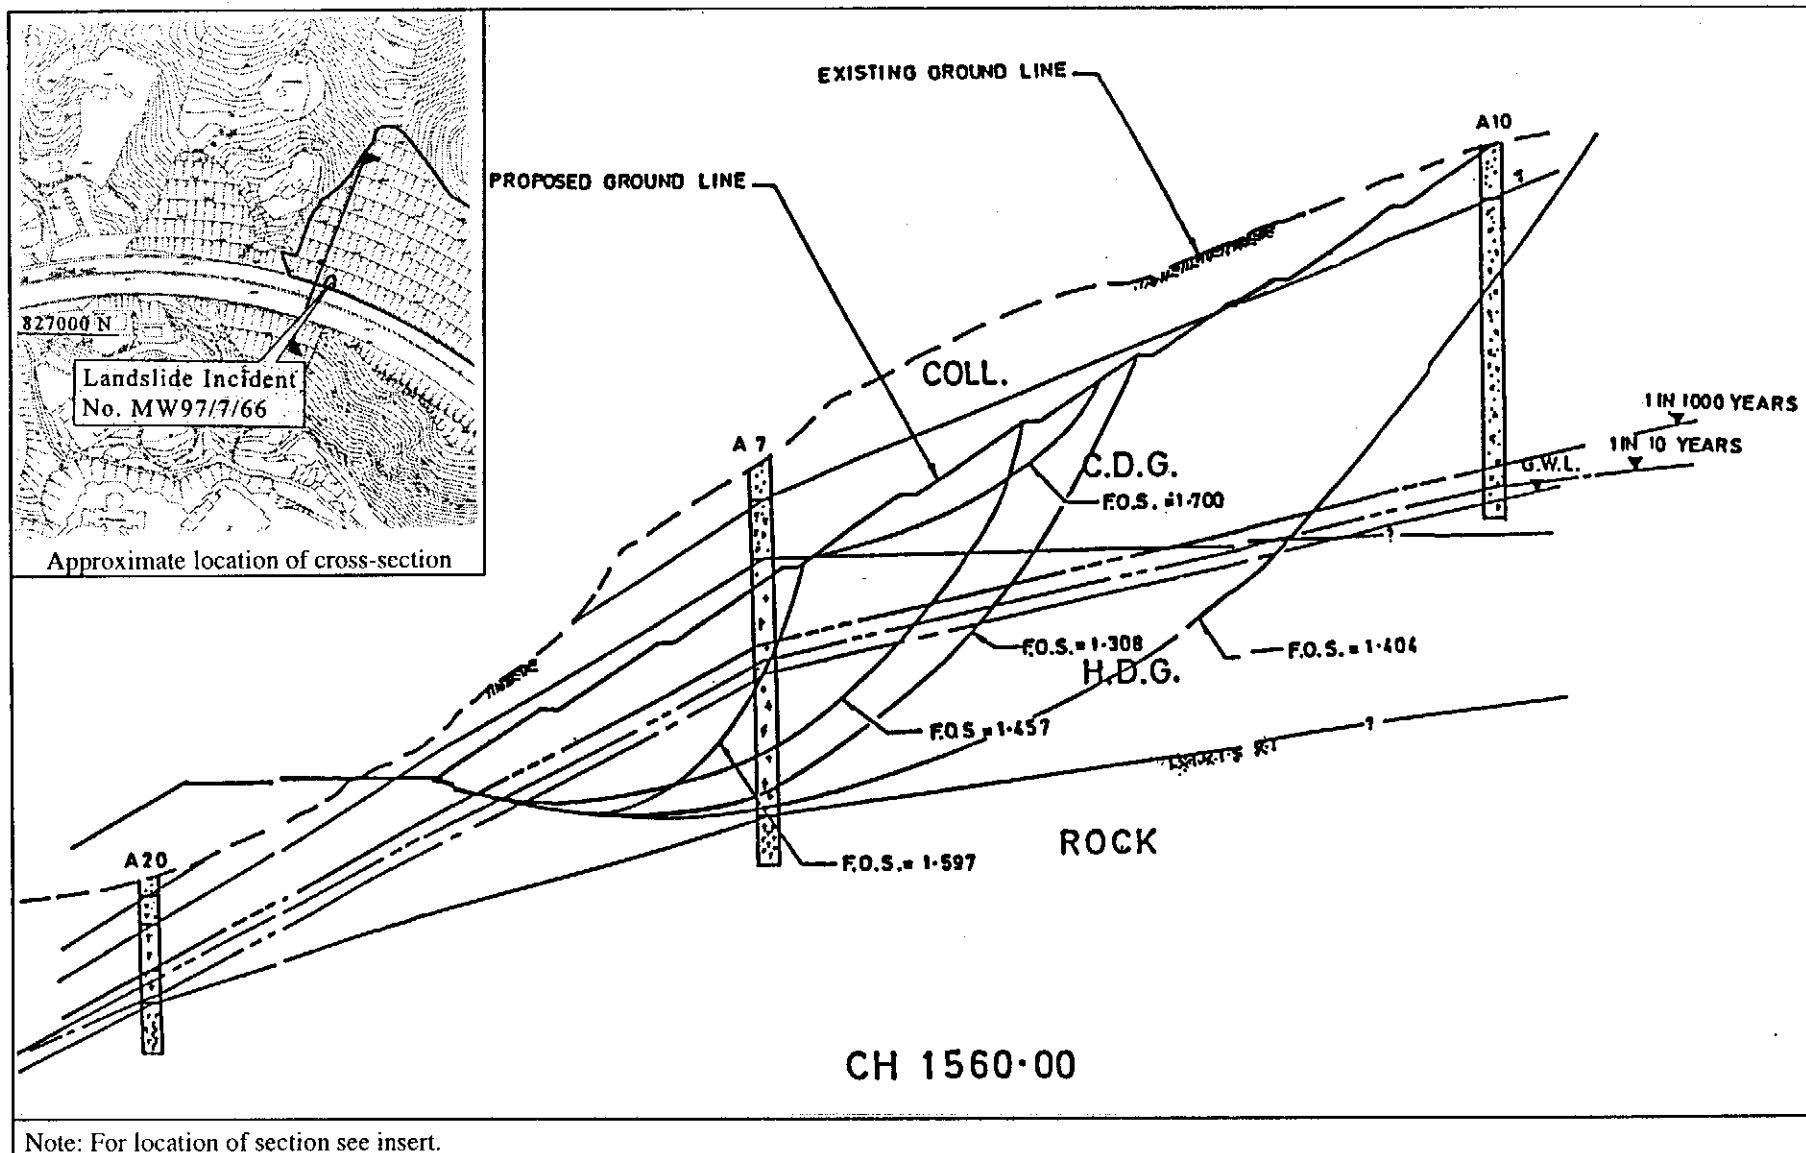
Design Slope Stability Section X - X at Chainage 1560 (MCA, 1986)
